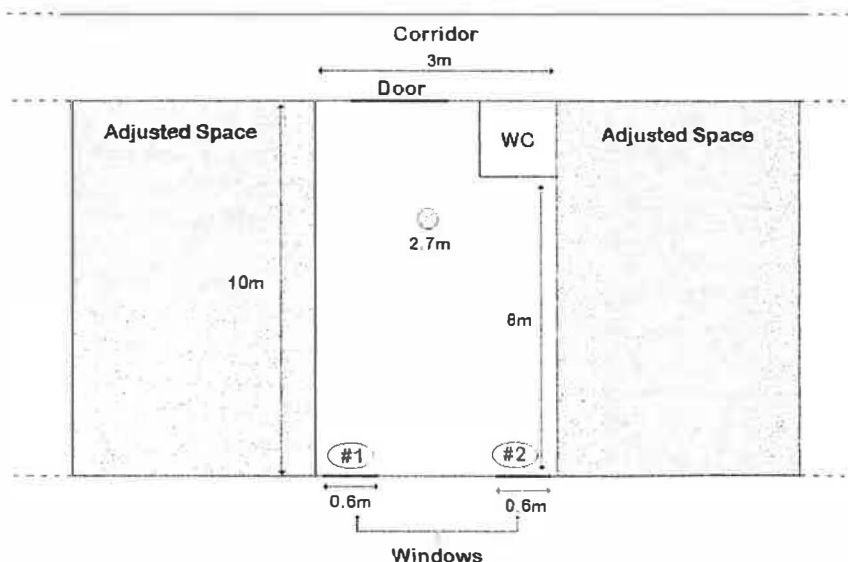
Plan of the zone where experiments have been carried out in the 'University' building.
